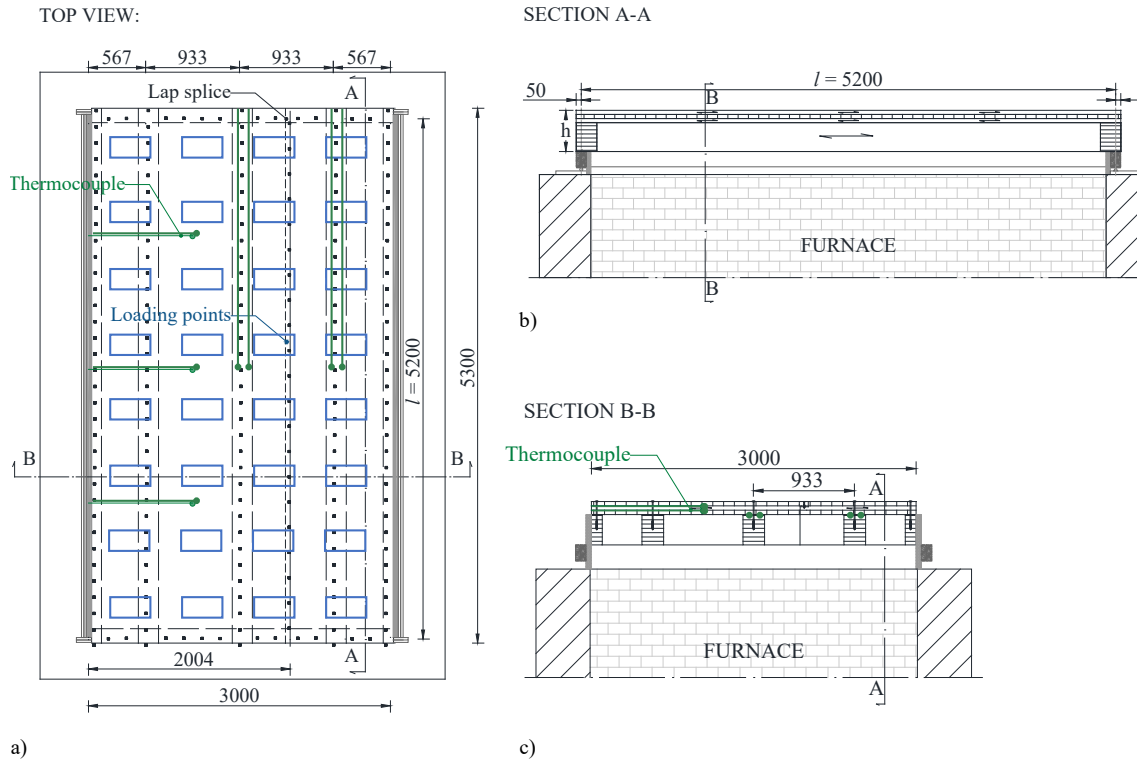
Fire resistance tests - Test setup on the horizontal furnace including loading, and thermocouple positions, in [mm]: a) Top view; b) Section A-A; c) Section B-B.
